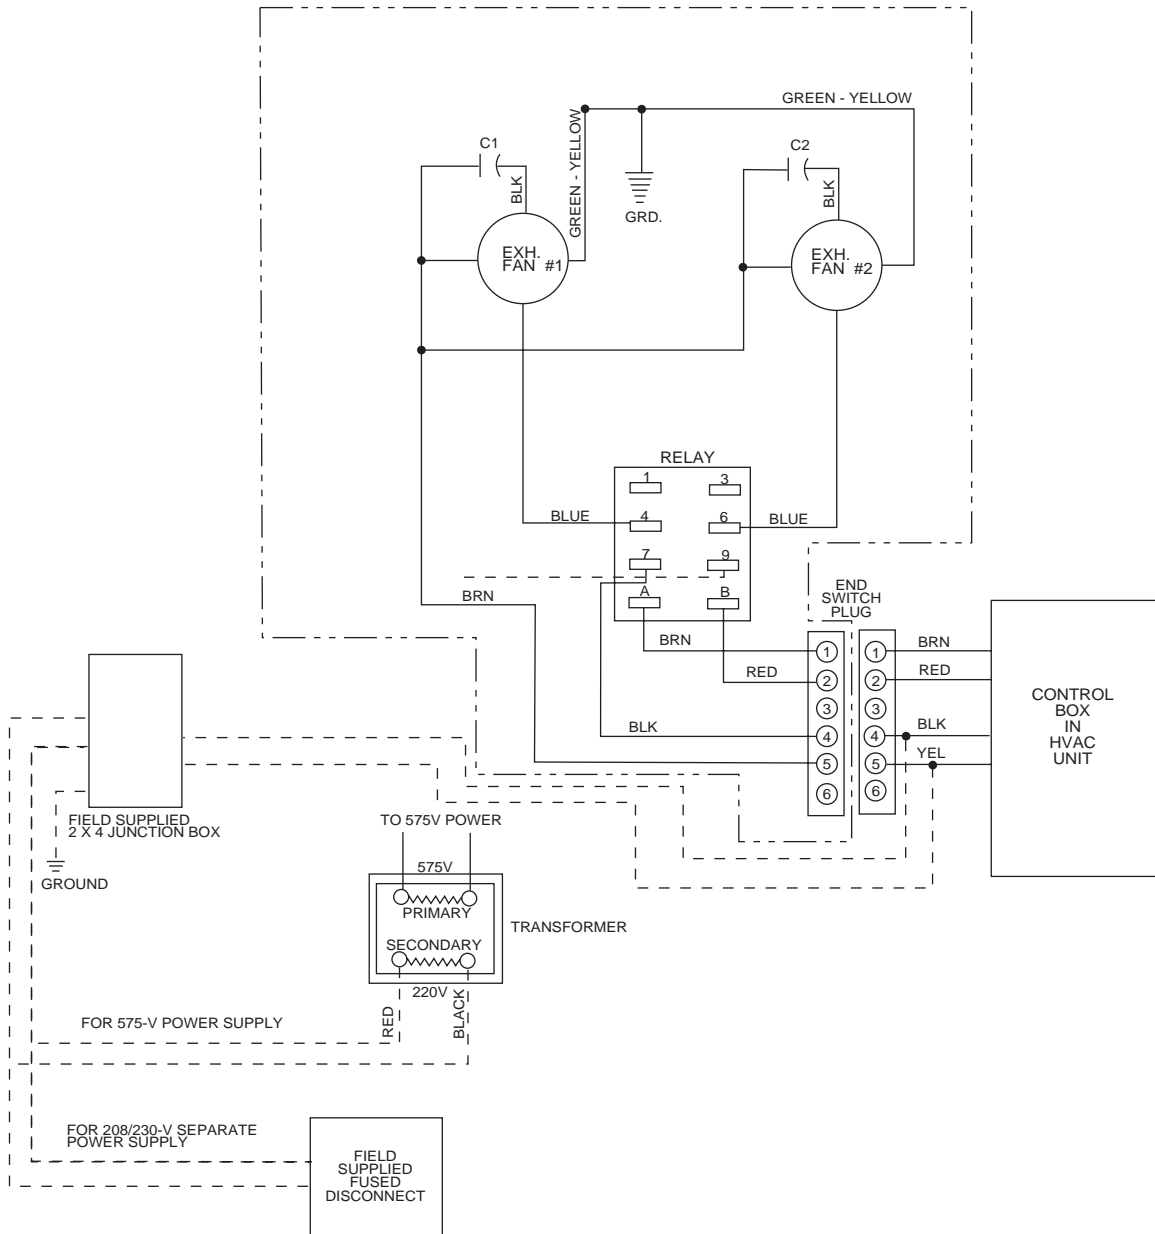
Power Exhaust Wiring — 208/230-v and 575-v Units
